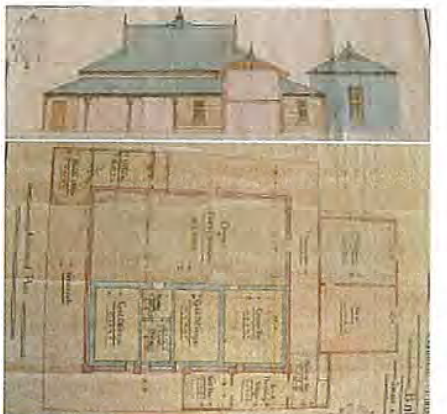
1902 drawings for Butter Factory showing similar roof structure and proportions as Building 3
